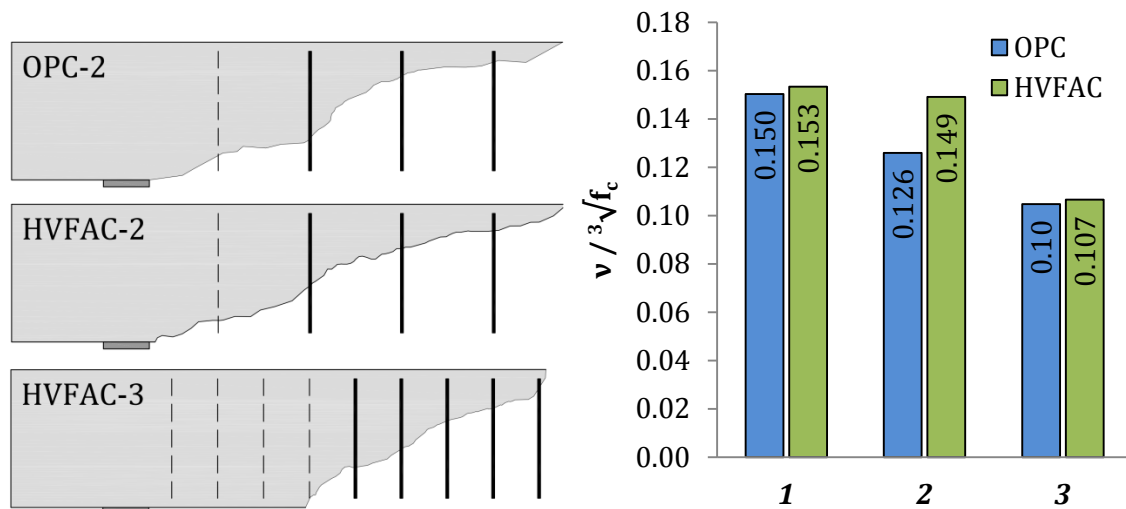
a) Stirrups intersecting the main shear crack, b) normalized shear stress carried by concrete
